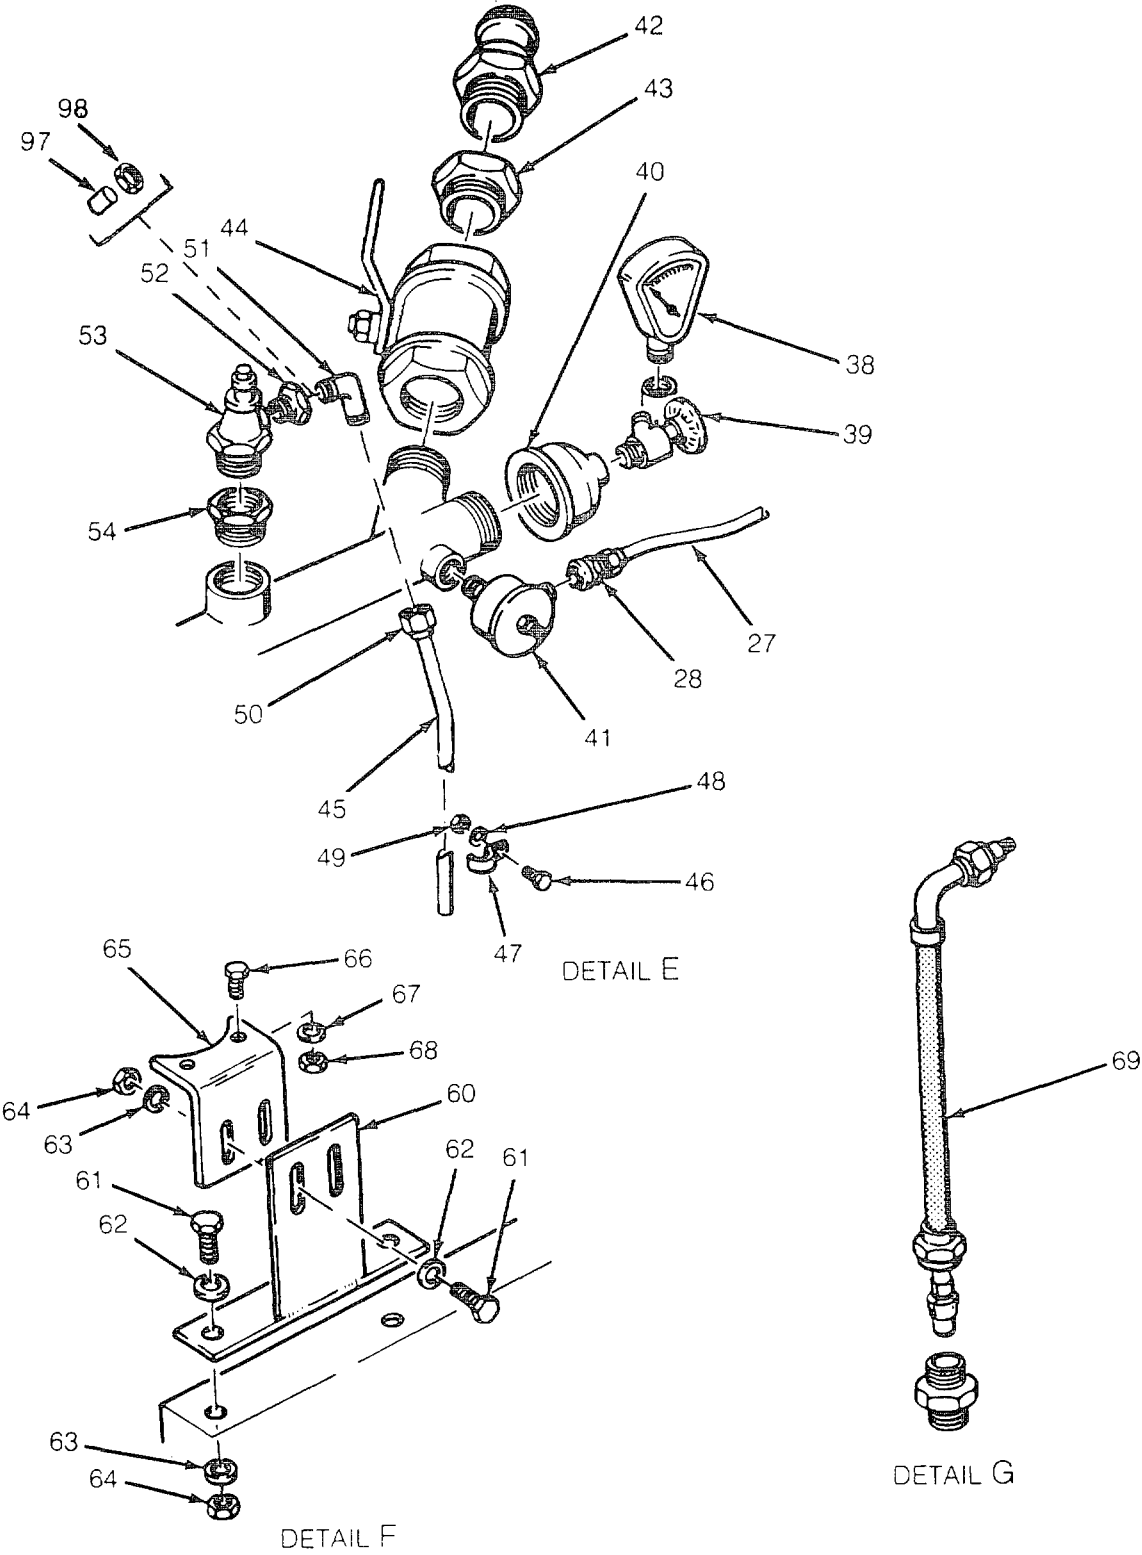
Water Heater Assembly (Sheet 3 of 4)
